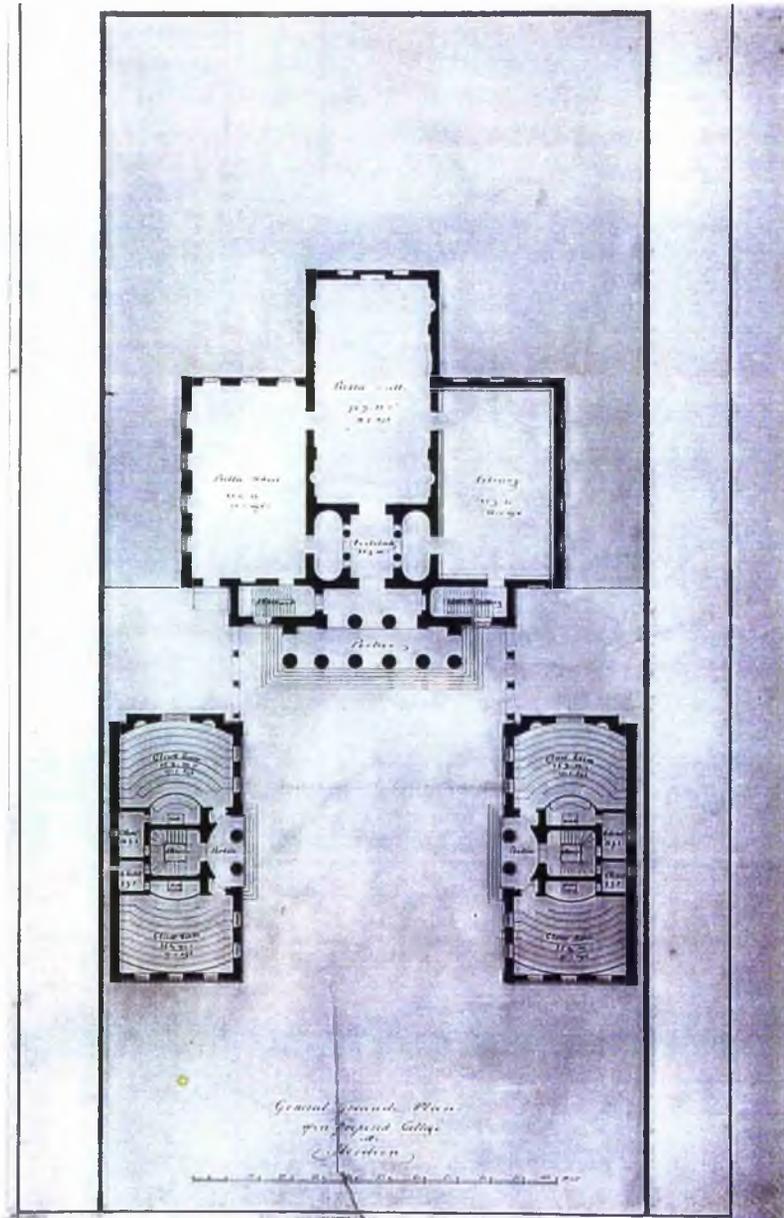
Undated and unsigned ground floor plan of a proposed college at Aberdeen.
